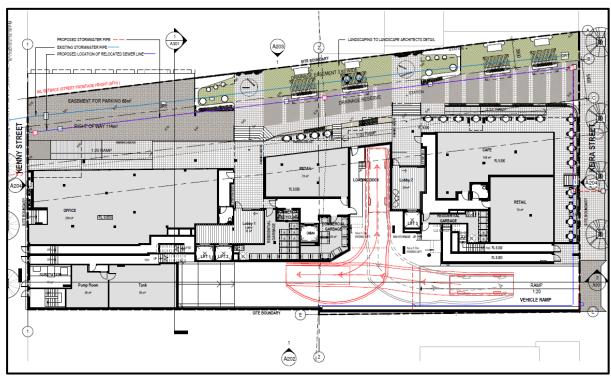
Proposed Site and Ground Floor Plan (*Source: Brewster Murray)
